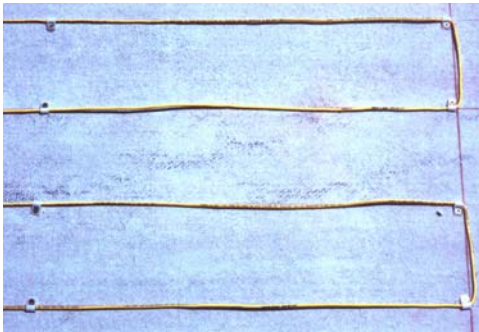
Installation of Tuff Cable on mortar bed. Tuff Cable is held in place with plastic clips attached to the sub-floor or sub-room with anchors, Plastic Clip Kit (Part Number PLASCLIPKIT).
